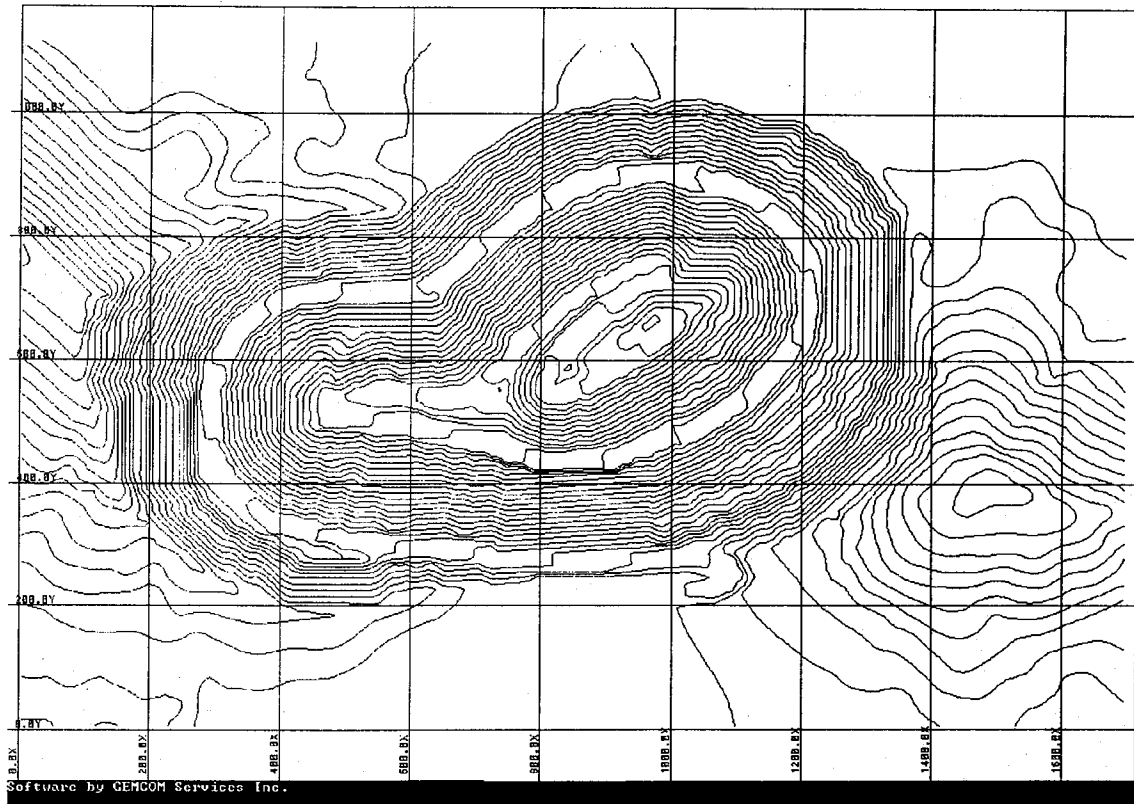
Pit # 7 - Whittle pit 1, third ramp.
